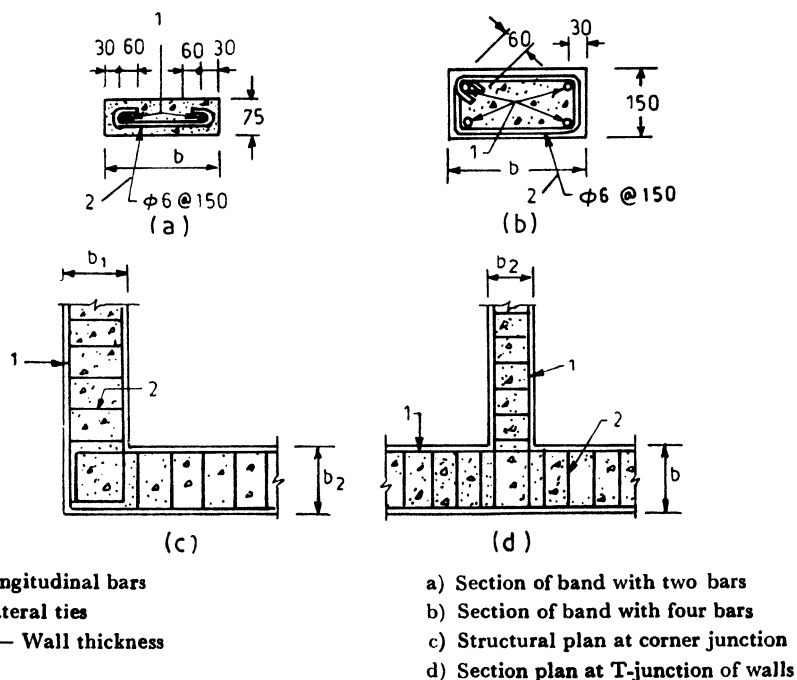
REINFORCEMENT AND BENDING DETAIL IN R. C. BAND
